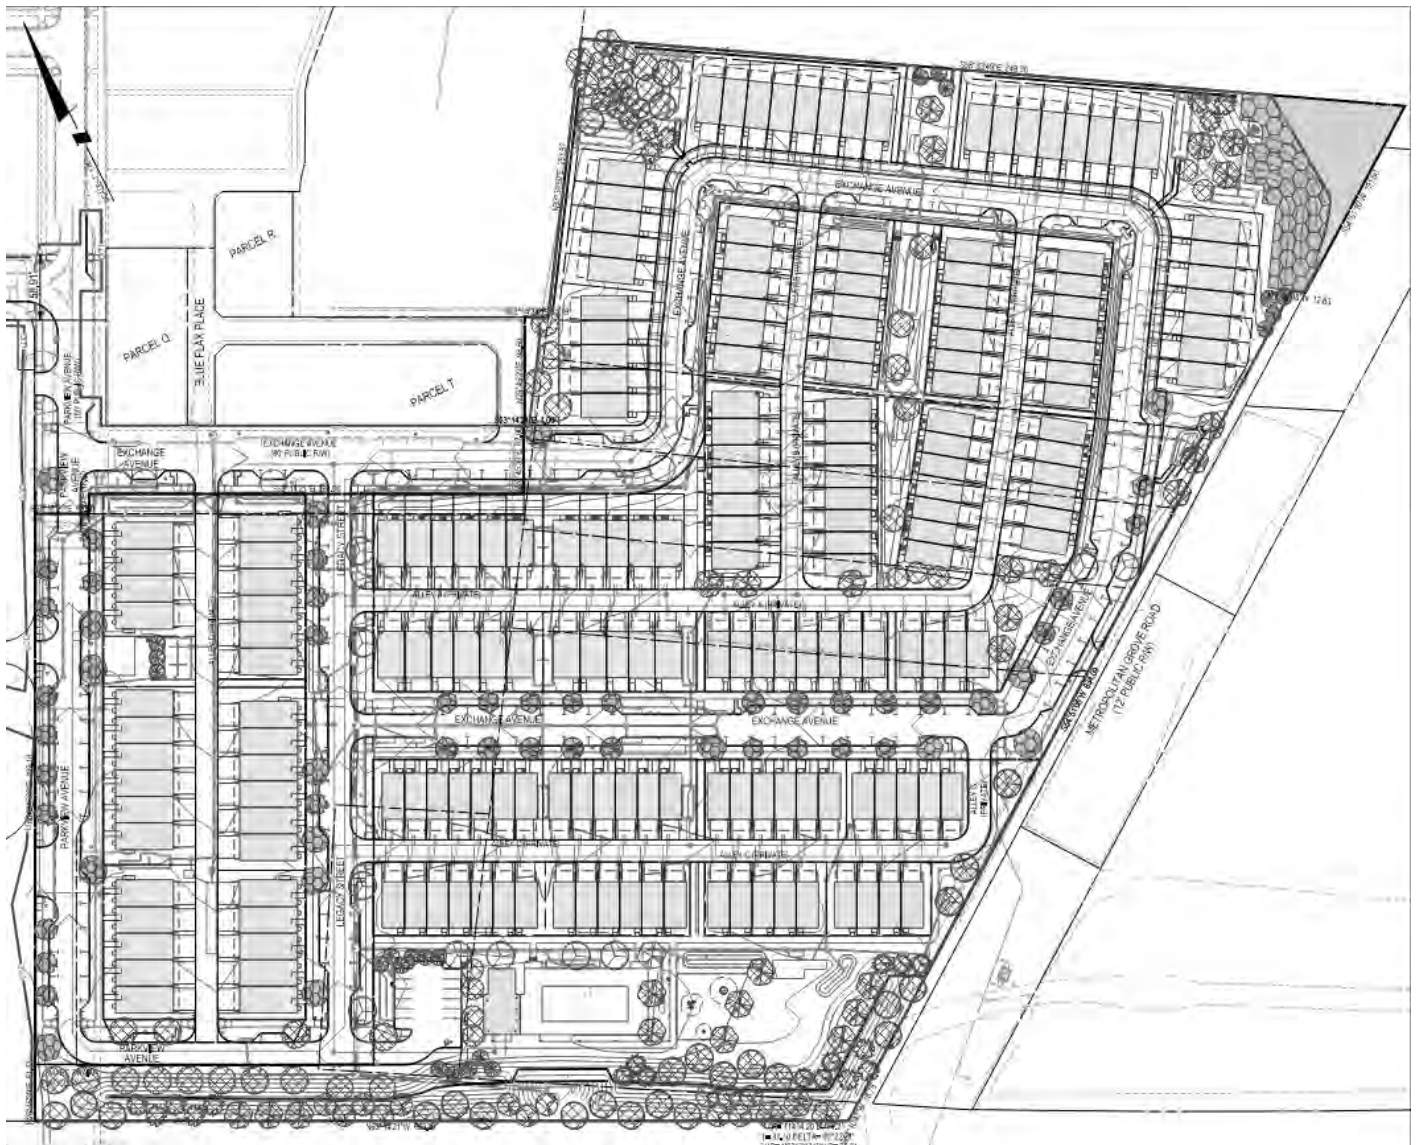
Final Forest Conservation Plan (Sheet 2)
